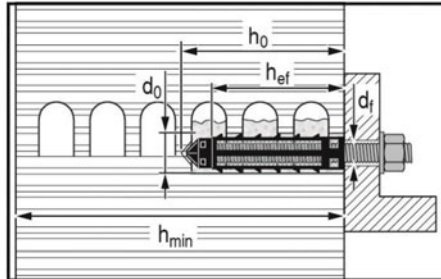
Hollow and solid brick with threaded rod HIT-V-... and two sieve sleeves HIT-SC for deeper embedment depth (see Table B6)
